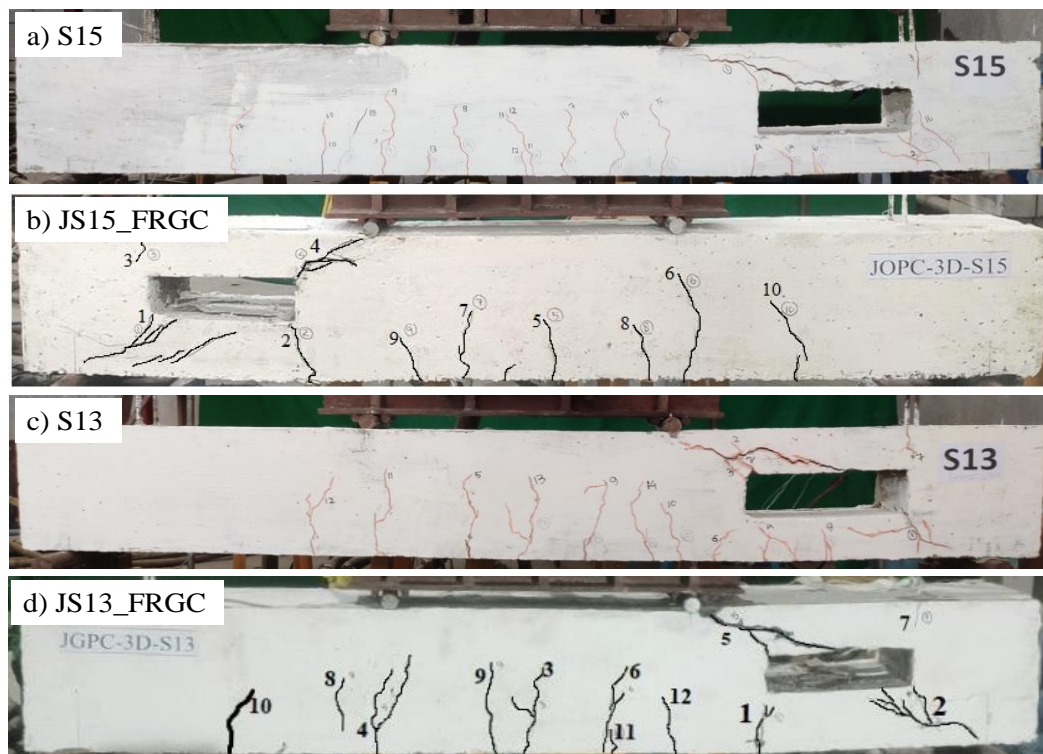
Crack patters of tested beam with shear-span opening (3rd Days)
